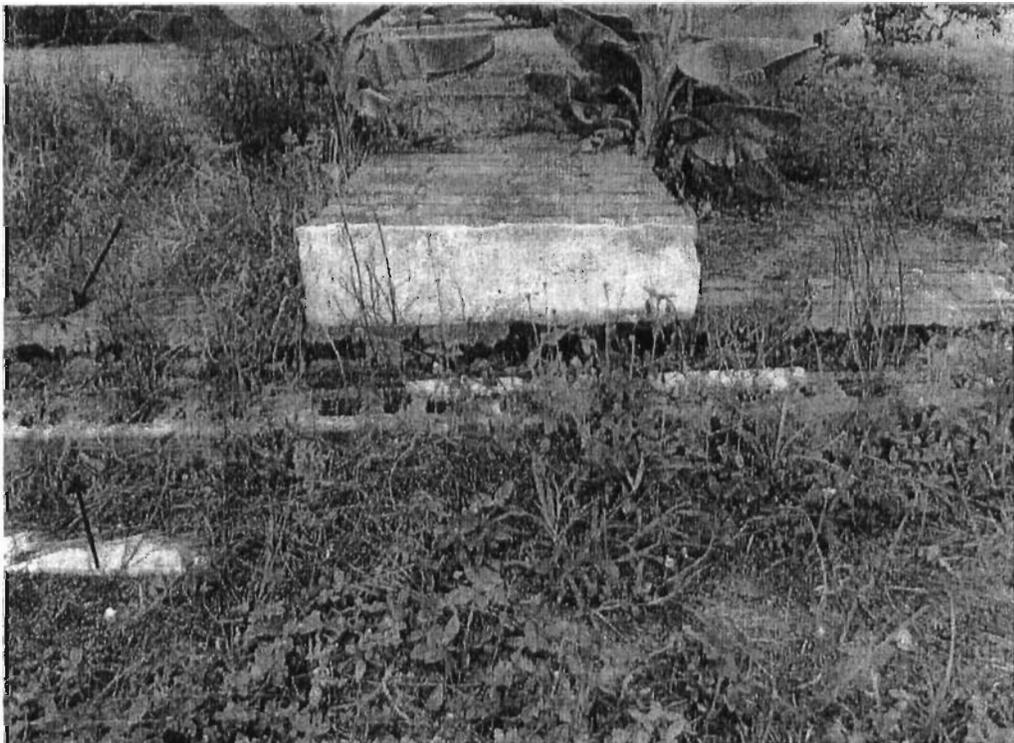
Another collapsed section of the privacy wall. Failure at this location occurred at the horizontal (bed) joint of the first (lower arrow) and second courses of masonry (upper arrow).
